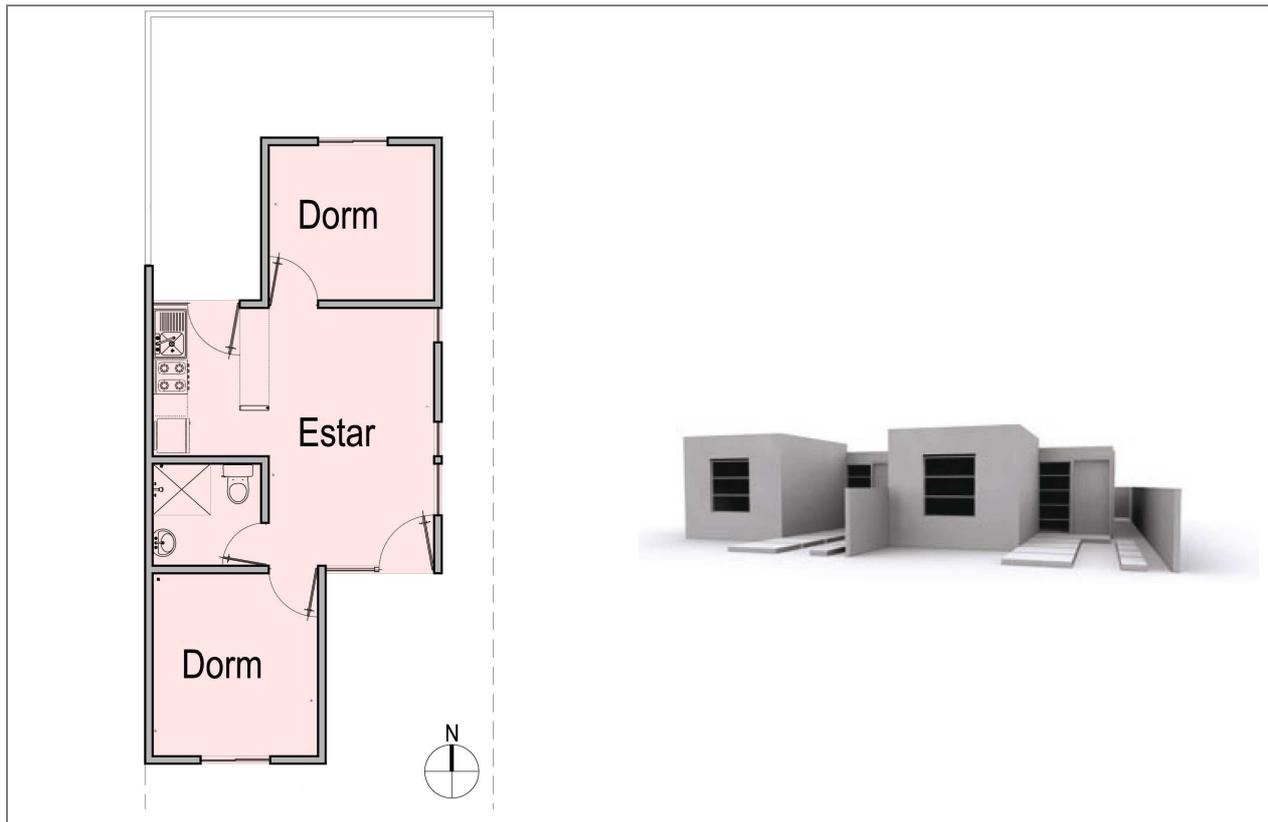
Aislada building type. Floor plan and 3D model, no scale
